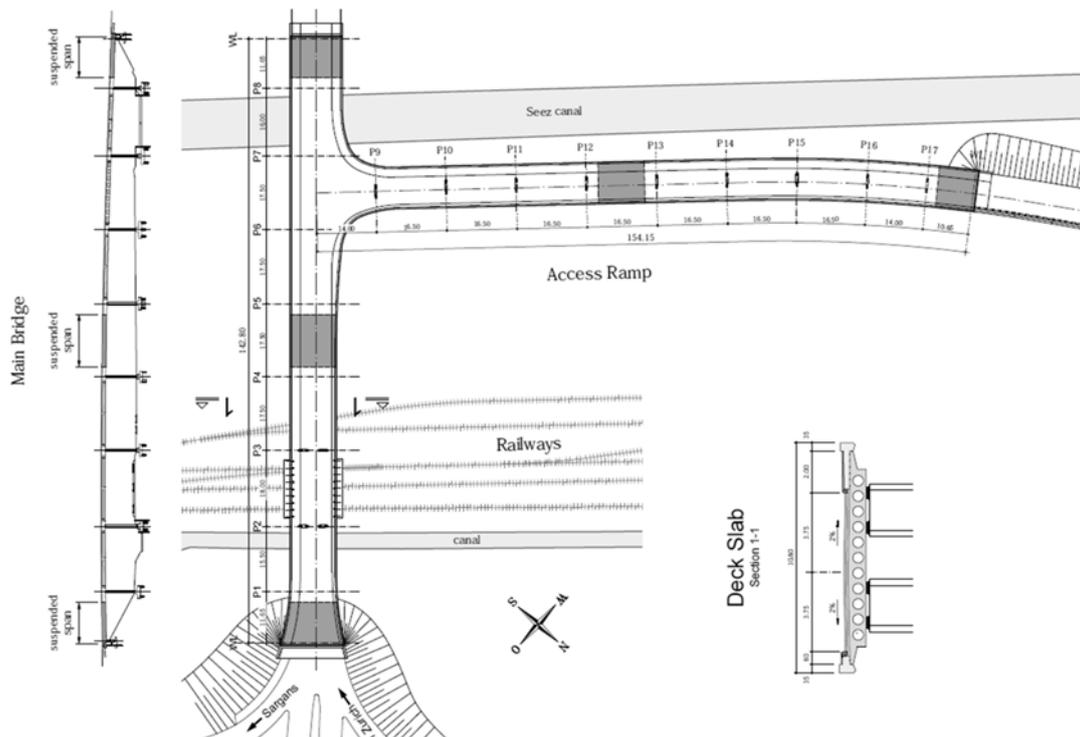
Plan of the bridge over the SBB facilities and the river Seez, with the position of the old suspended girders shown in solid grey.
